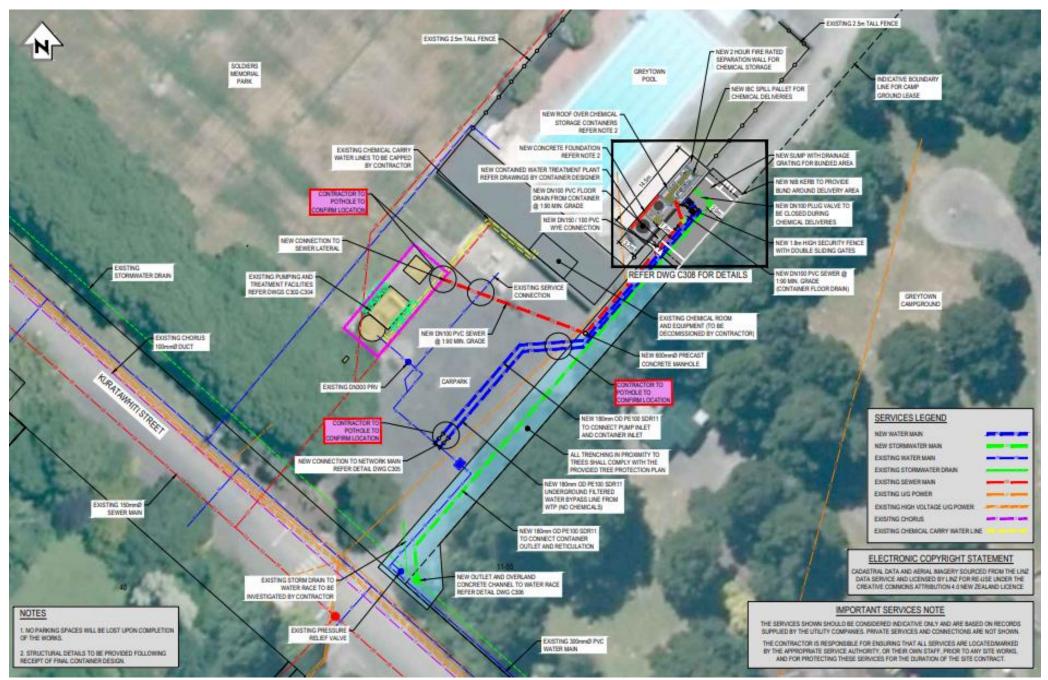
Soldiers Memorial Park WTP upgrades site plan (proposed permanent arrangement)
